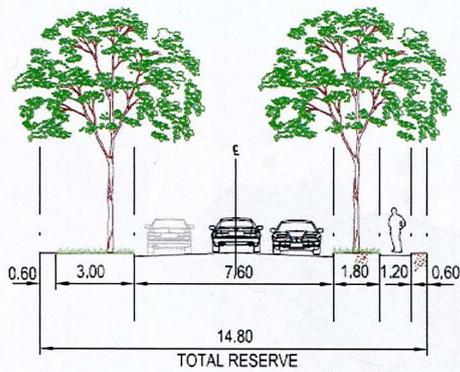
Road Type 8: Minor Local Street next to Public Open Space
